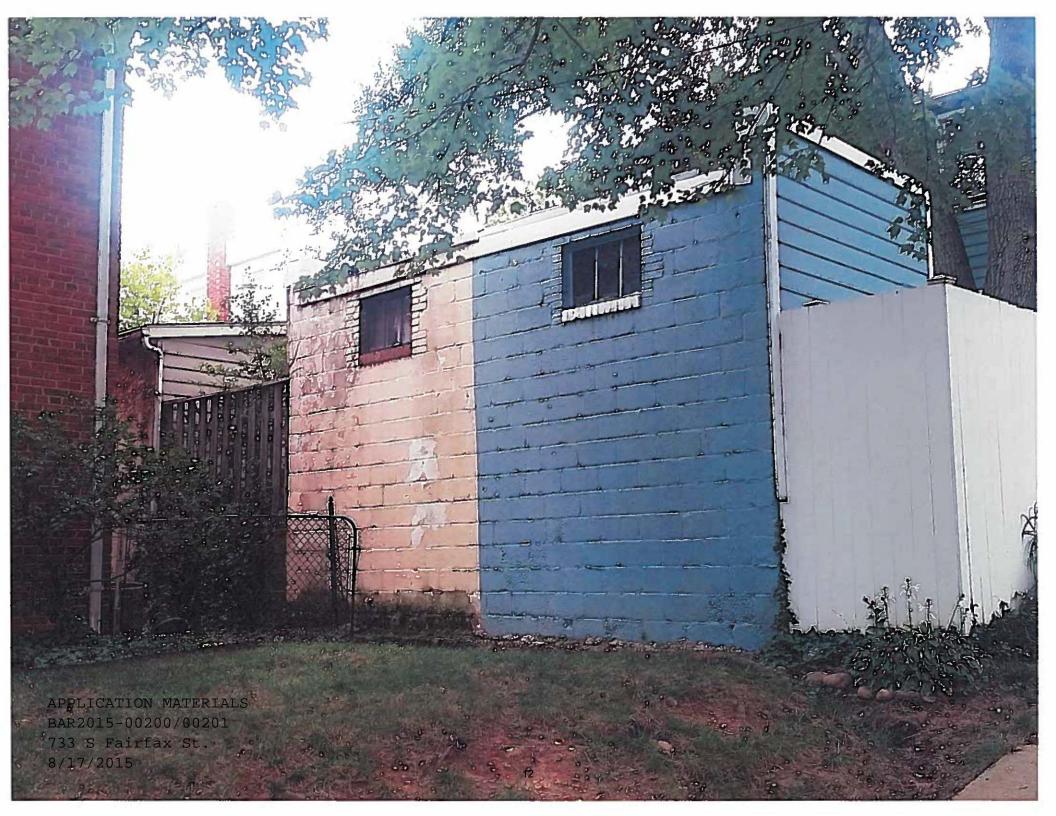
FROM THE BACK NORTHERN SIDE CORNEC S'HOWINK FIRST FLOOR FLETHEST BACK WALL, THE FIRST FLOOR SET BACK WALL, THE FIRST FLOOR SET BACK AND THE SECOND STORY
